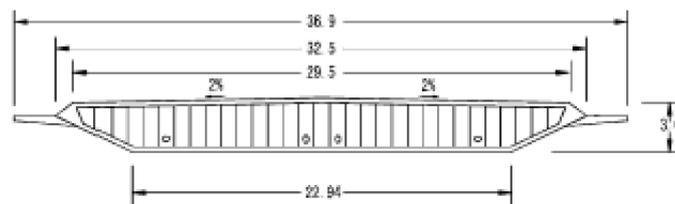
Cross section of deck of Jiang Yin Bridge (Unit: m)
